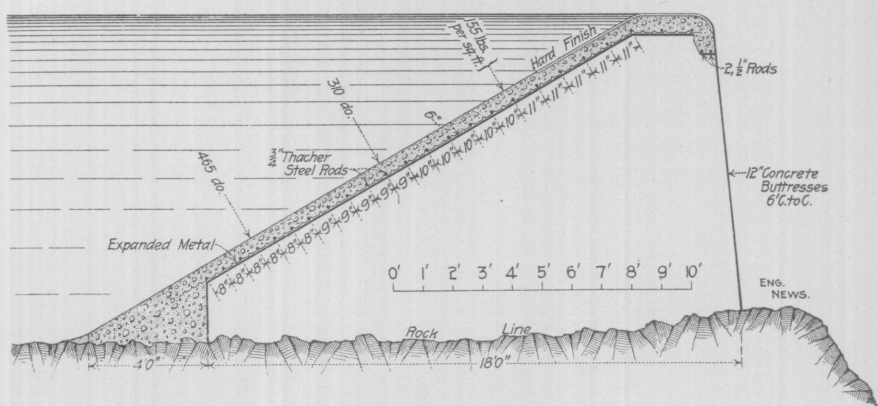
Section of Armored Concrete Dam, Theresa, N. Y.
